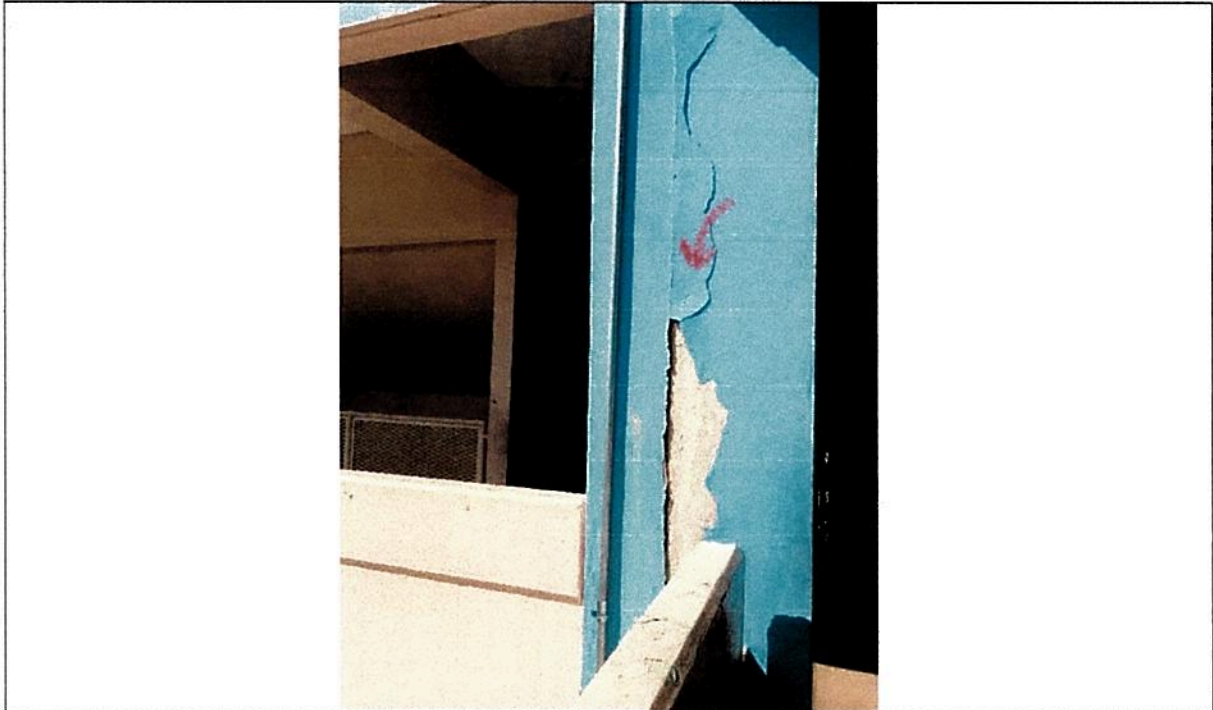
Cracks (Horz.) between CMU walls and same CMU wall sections between each 2ble T Beam webs (many cases)
